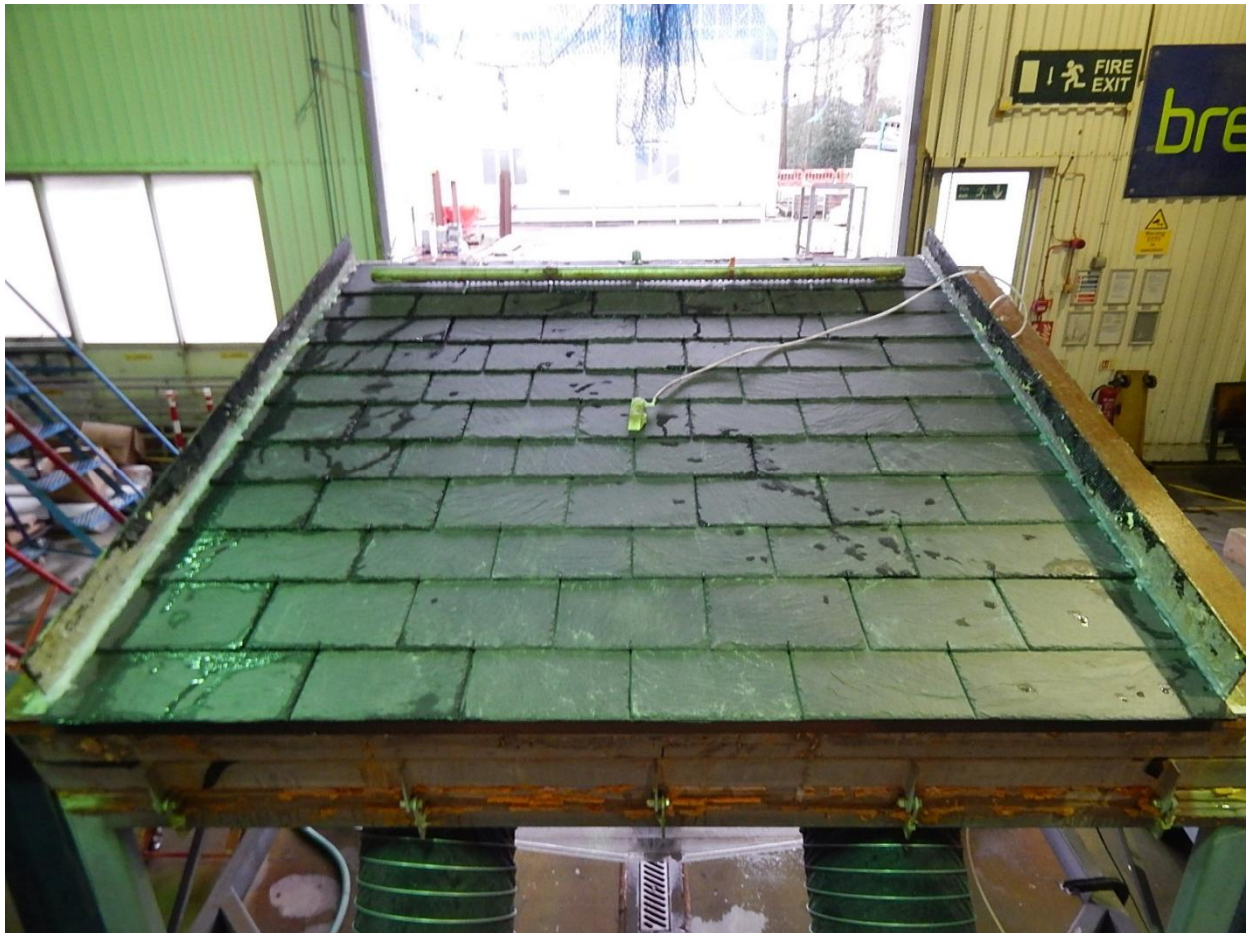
View of the Siga 65 Slate with slate hooks installed on the BRE test rig.
